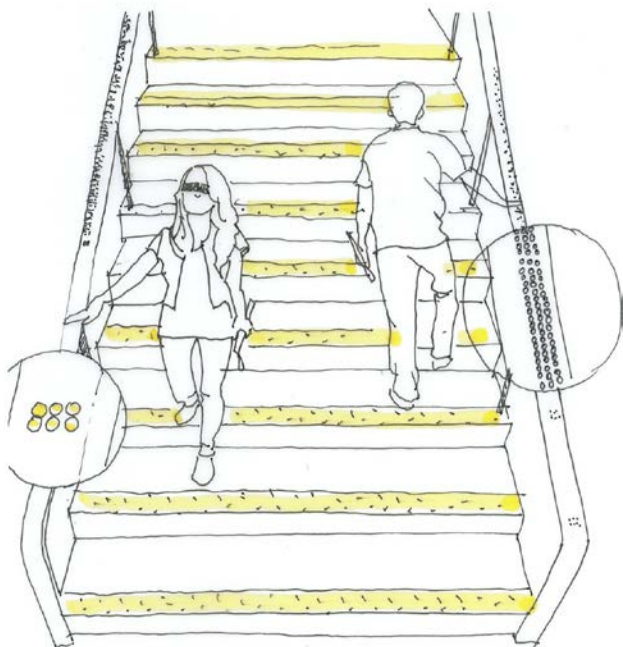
STAIRCASE HANDRAIL WITH BRAILLE INDICATIONS
